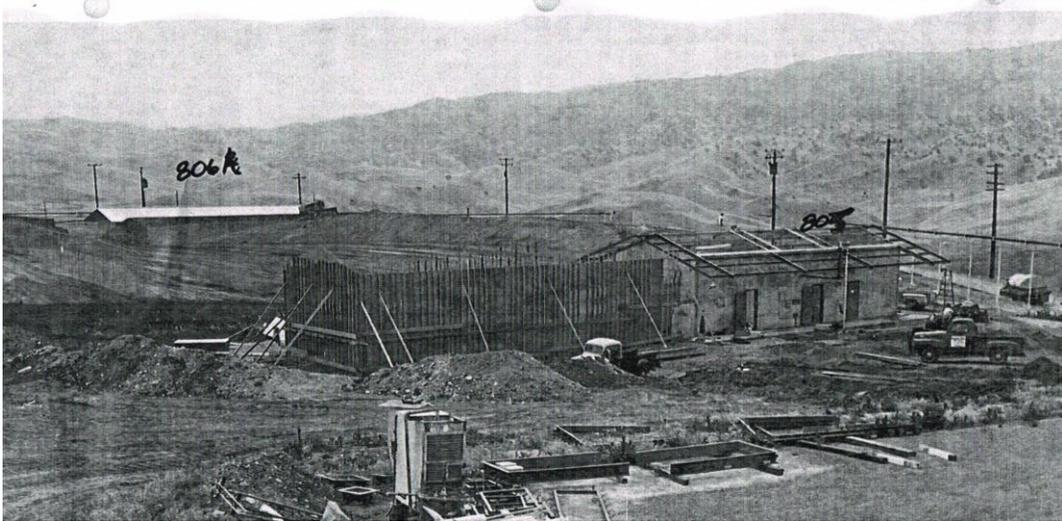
Increments 1 and 2 of Building 805 under construction, ca. 1958.
